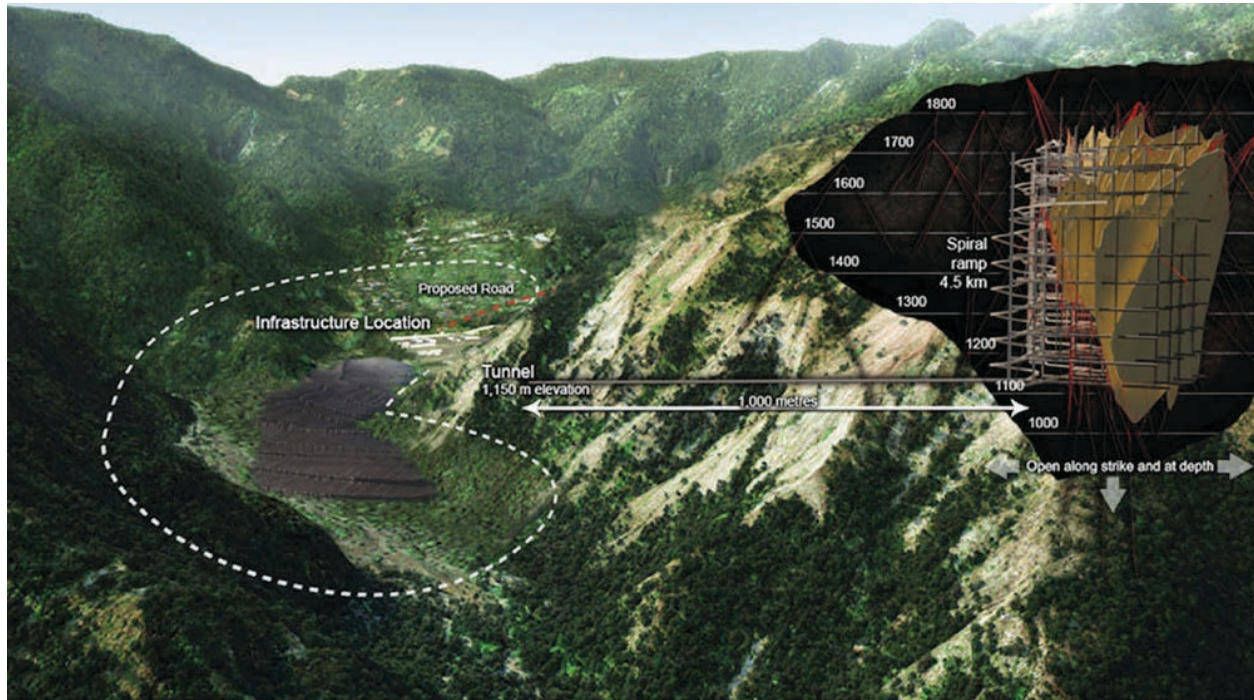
One-kilometre Underground Access Tunnel in the Higabra Valley
